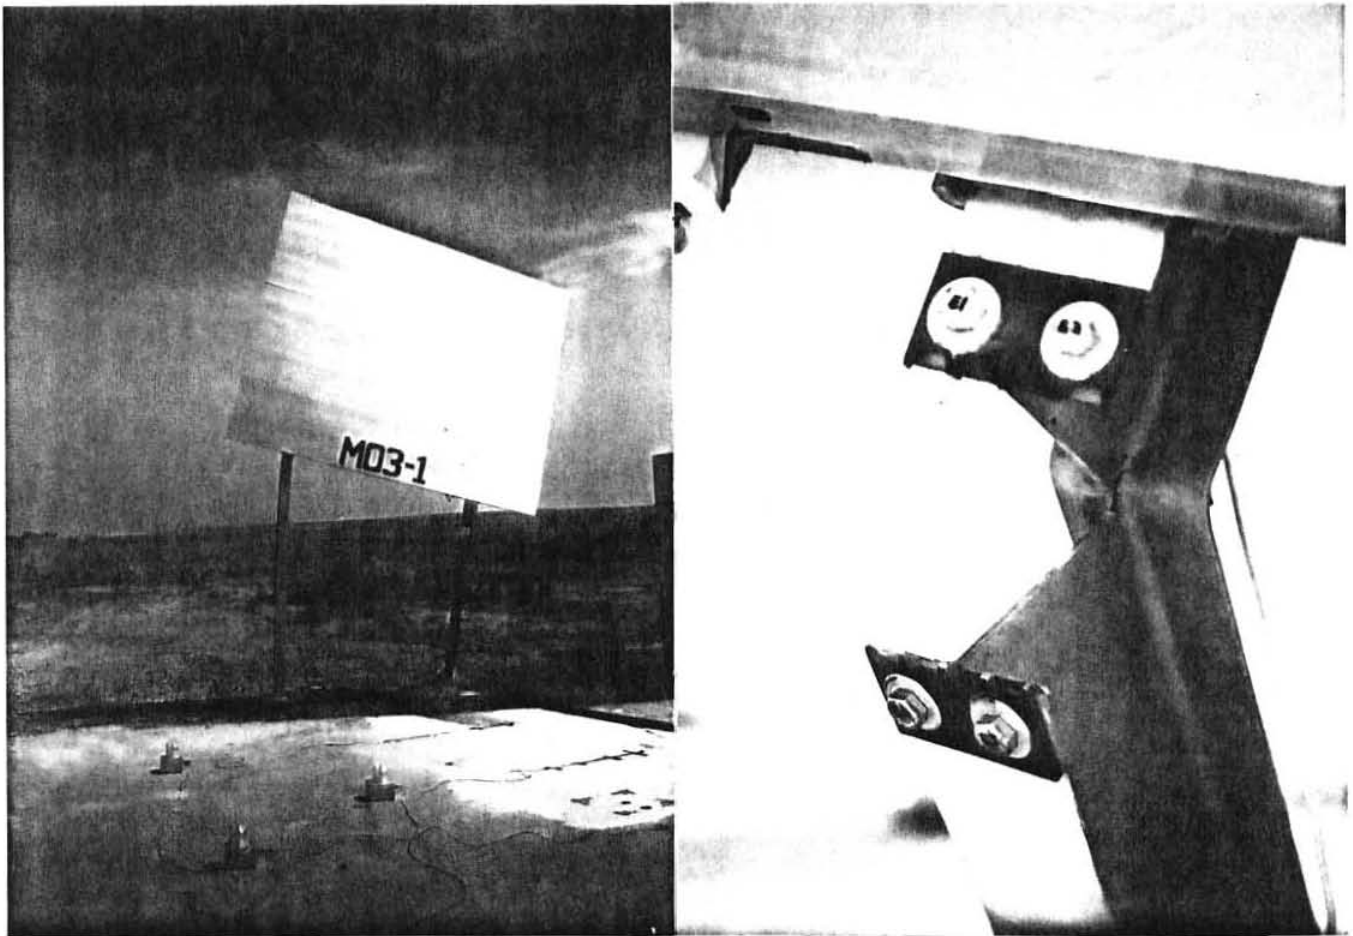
Sign Installation and Fuse Plate Damage: MO3-1.
